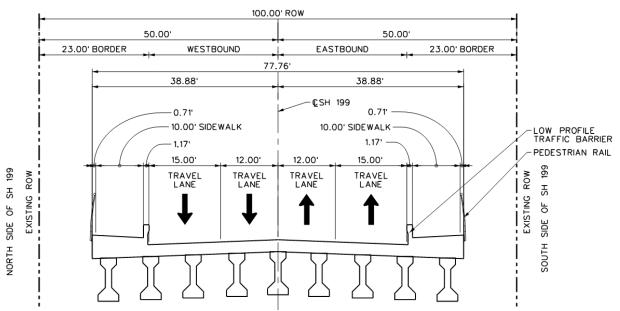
Bridge at West Fork of the Trinity River Typical Section
